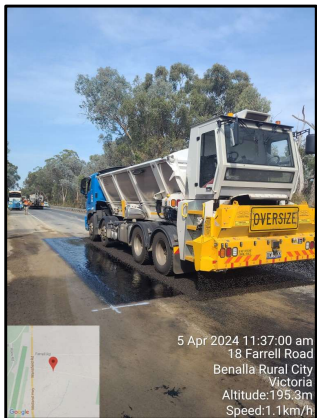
10/7mm Primerseal occurring on Stabilised Pavement
